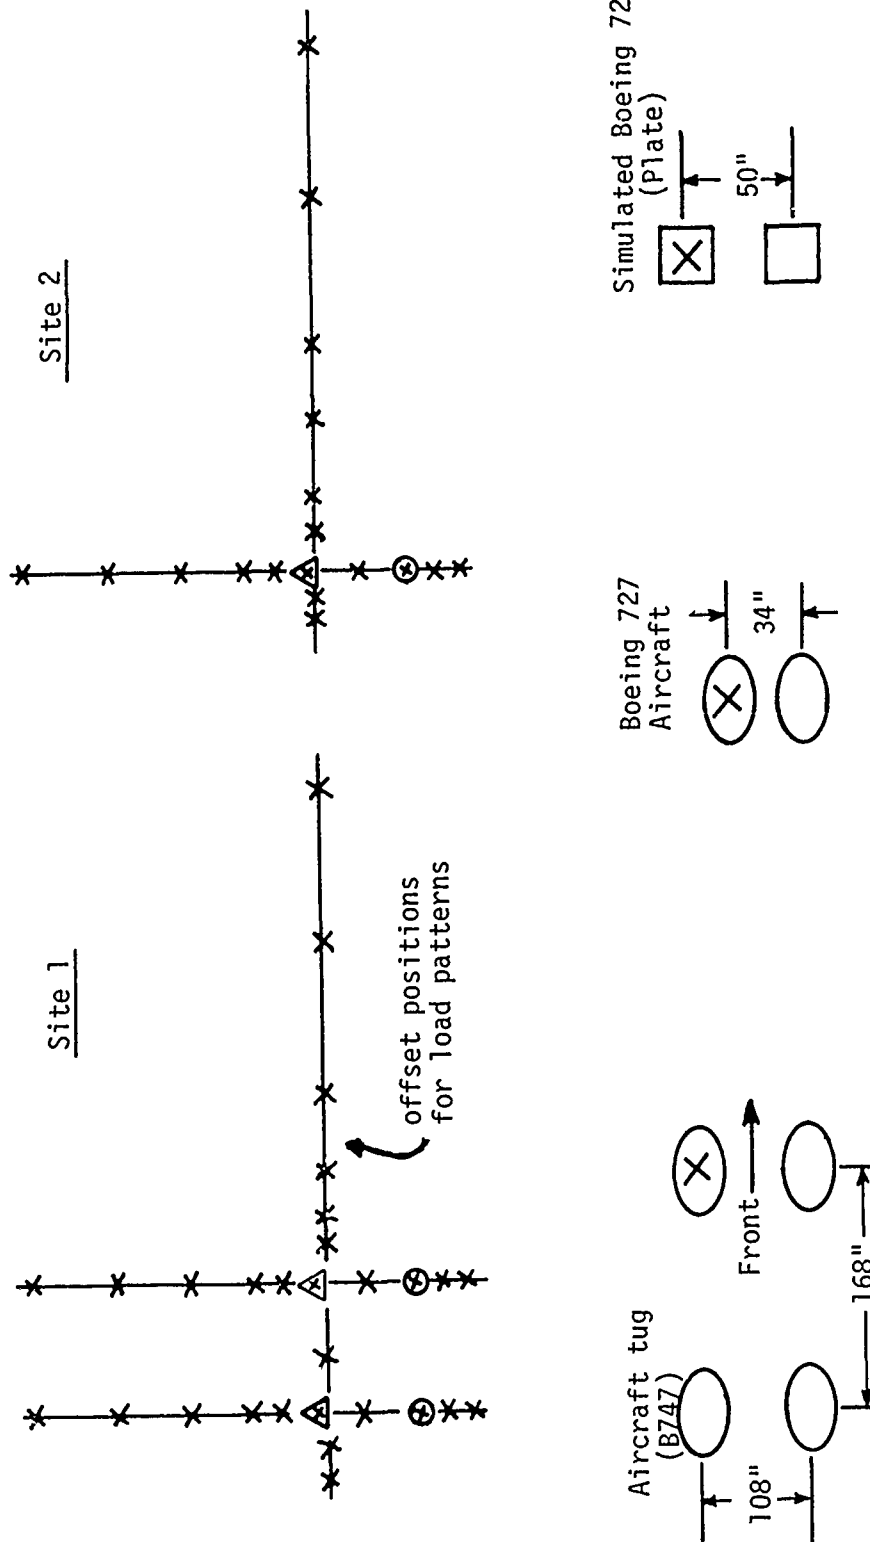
General layout for longitudinal and transverse offsets at Sites 1 and 2 for the three test loads (not to scale).
